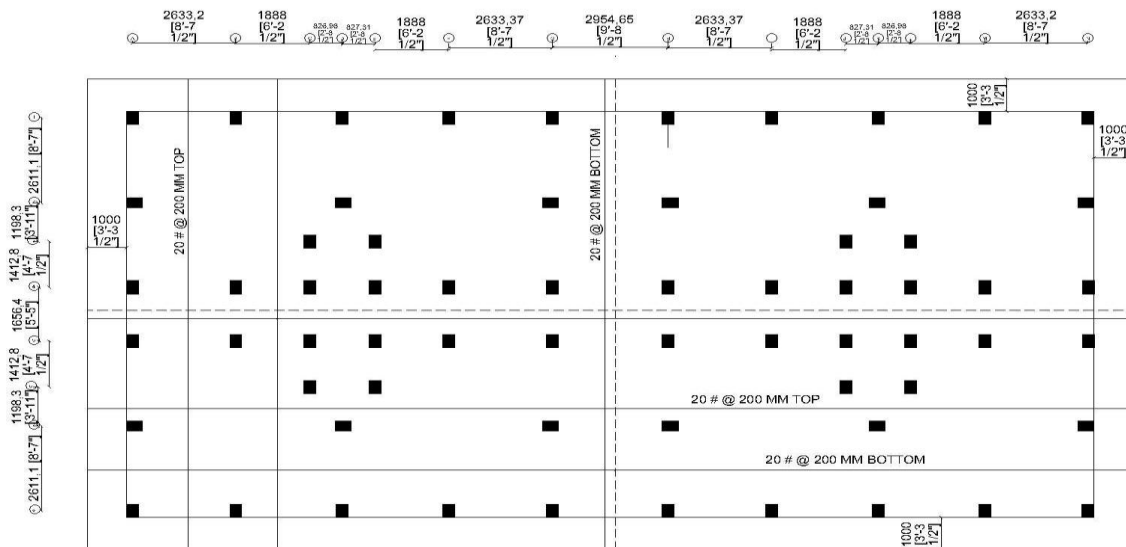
(e): The section plan of the Mat foundation in a single unit in resettled village
